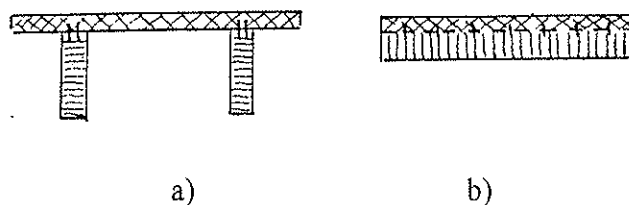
Cross section of timber concrete composite decks: a) timber-girder concrete composite, b) timber-deck concrete composite
